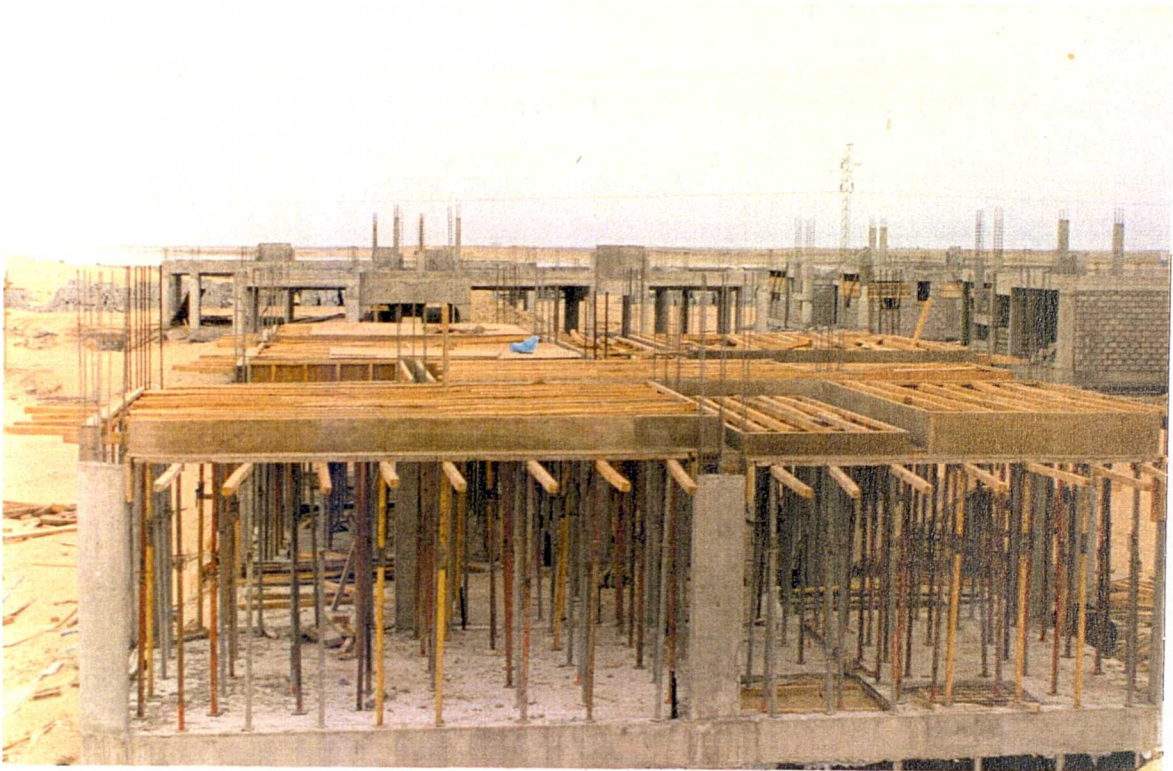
The scaffolding work for roof slab of low-cost house under construction
